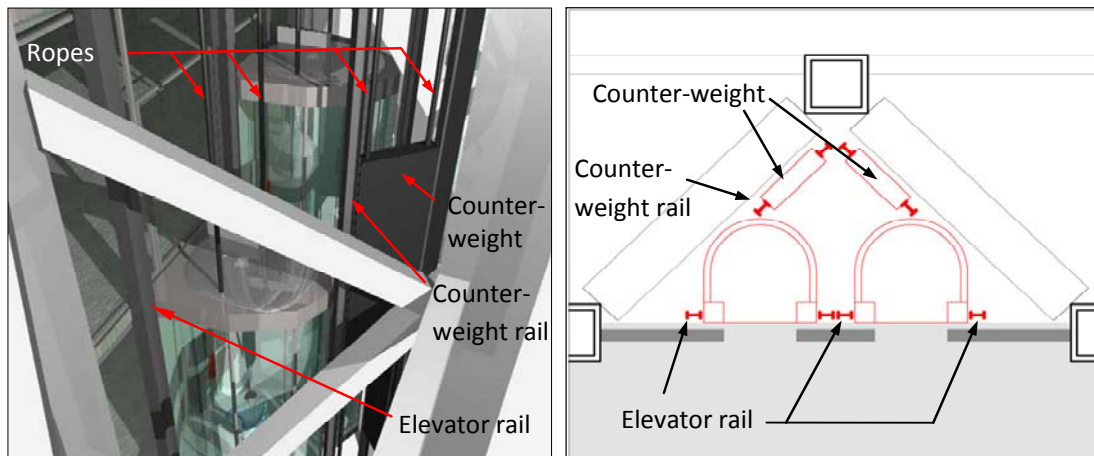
(a) The elevator components; (b) Elevator details in plan
